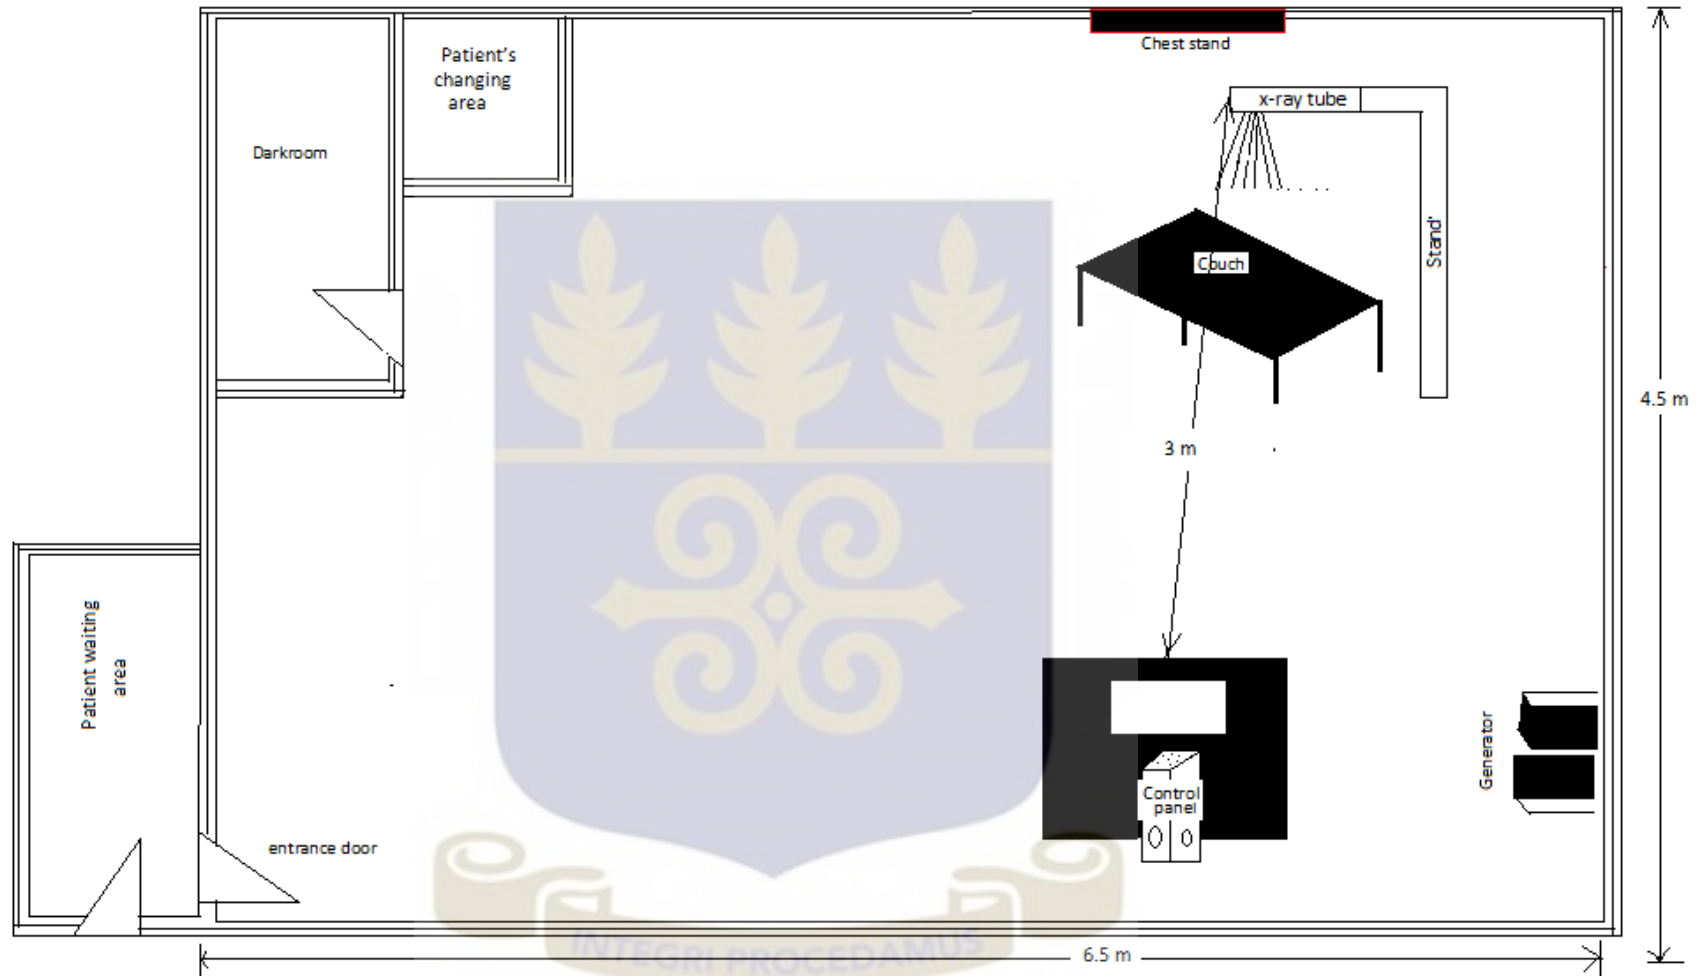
Mtengo wa Nthenga Hospital X-ray Room Layout
